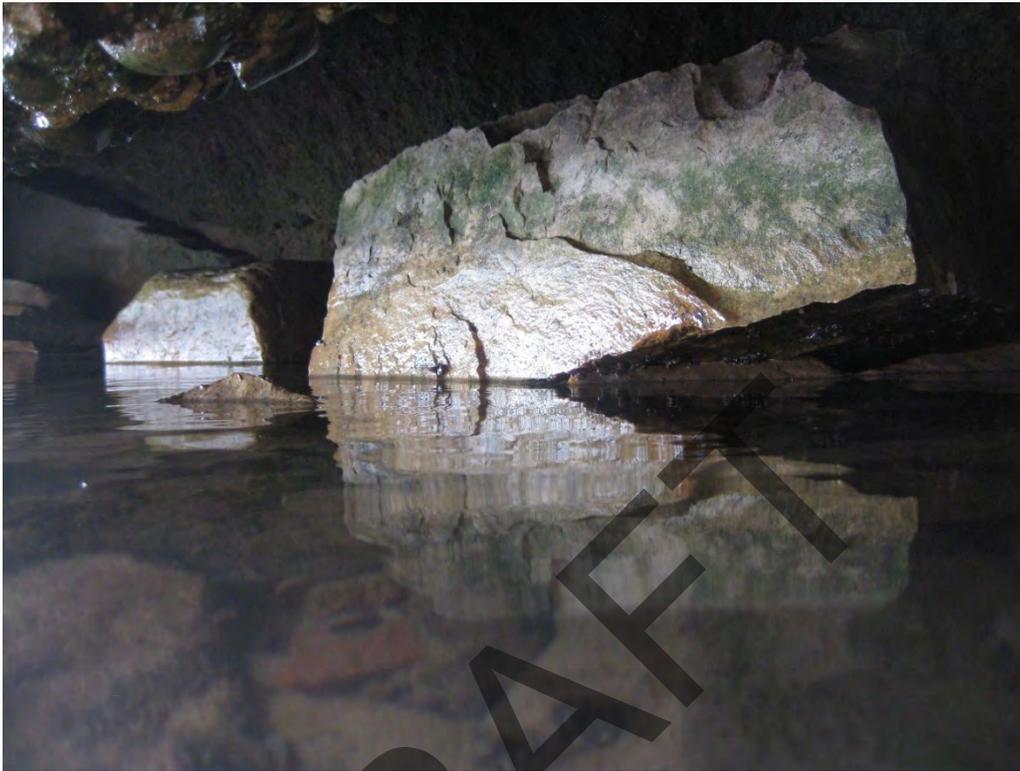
Voids directly under concrete cap. Missing sheeting has allowed rubble fill to erode from crib.
